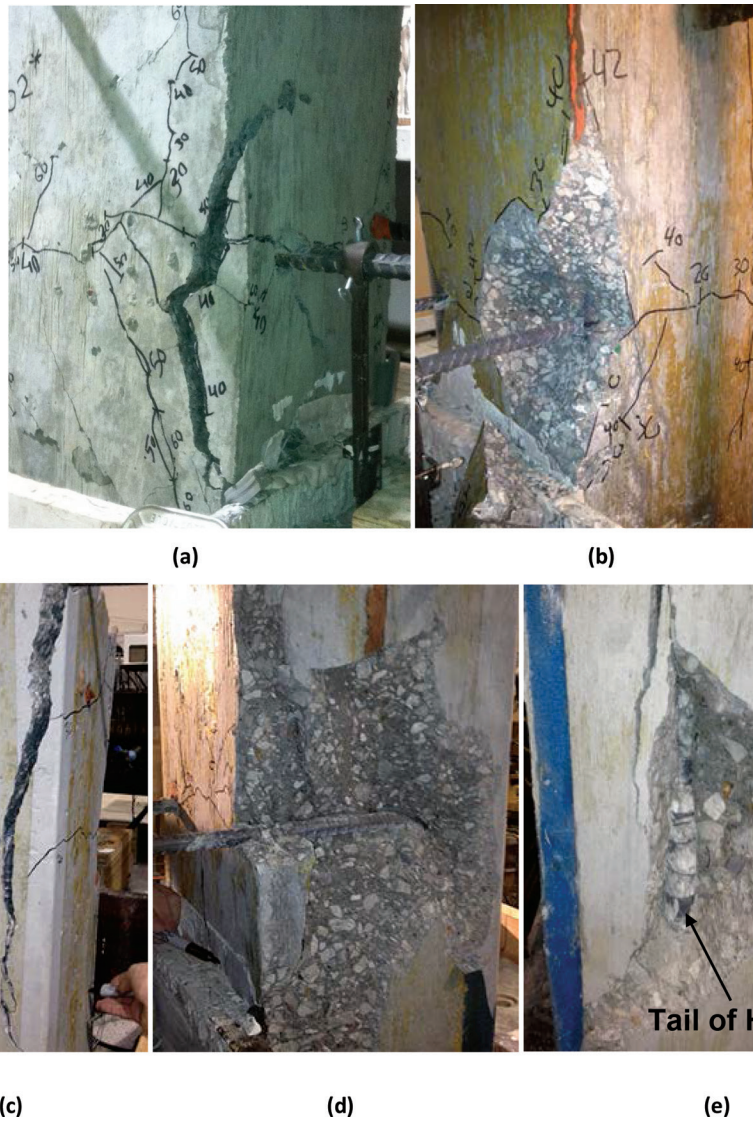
Failure modes: (a) front pullout; (b) front blowout; (c) side splitting; (d) side blowout; and (e) tail kickout.
